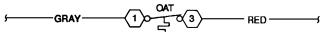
Wiring Connections for Outdoor-Air Thermostat
